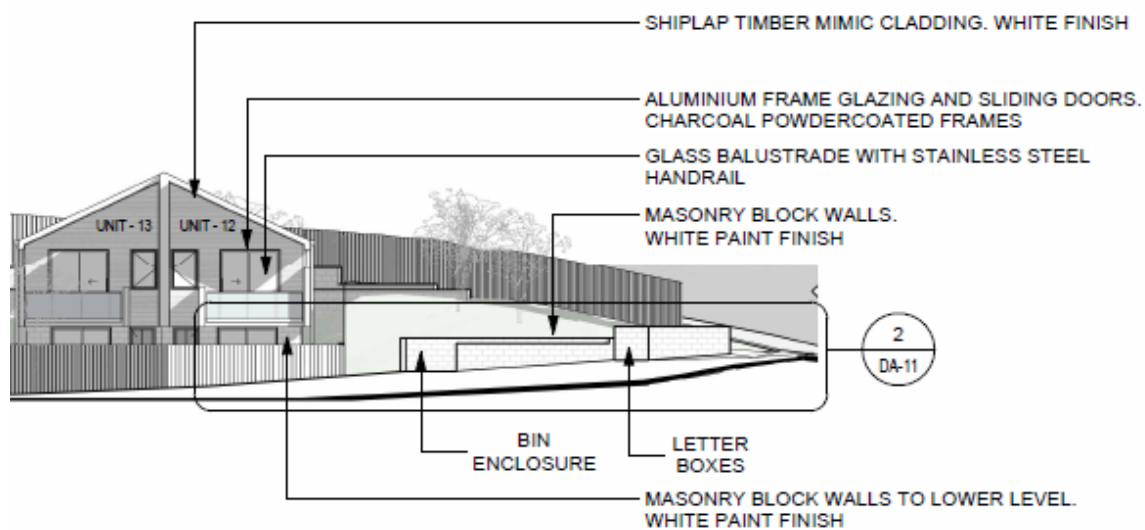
Extract from Site Elevations, as prepared by Jaws Architects, drawing no. DA-05 showing the bin enclosure area
